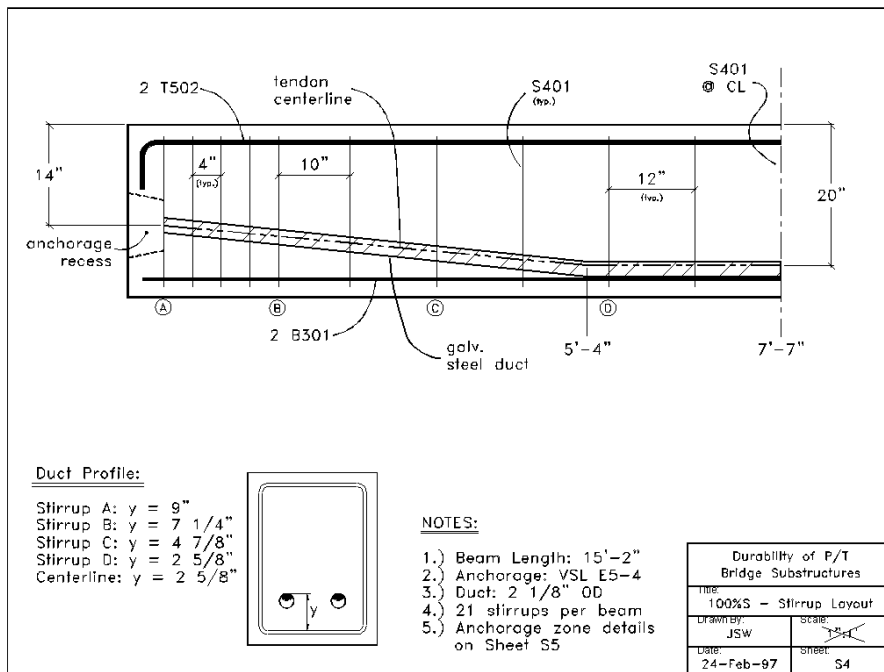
Sheet S4: 100% S Stirrup Layout^{4.2}
